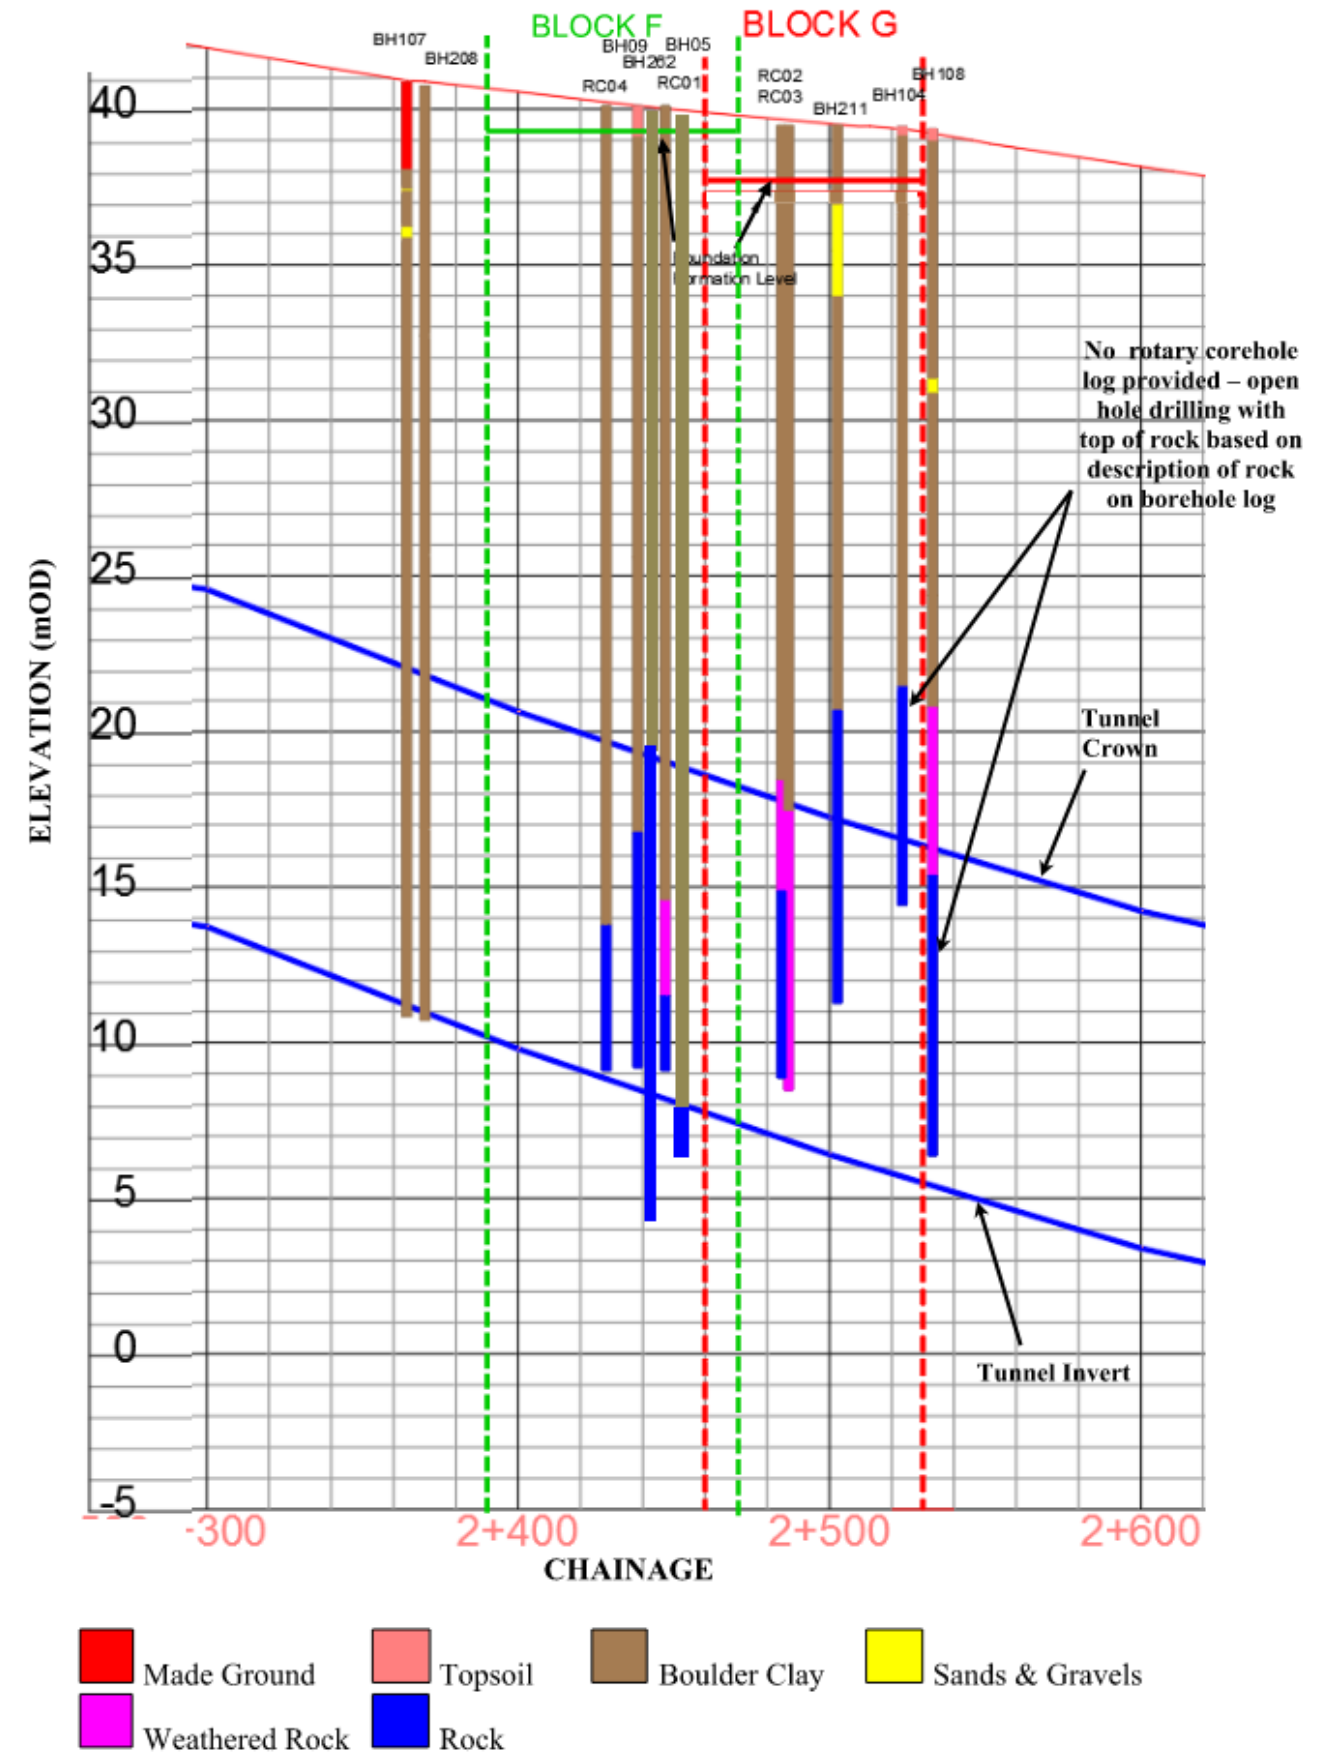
Subsurface ground profile along northbound tunnel within site from AGL Consulting Geotechnical Engineer's Tunnel Impact Assessment
